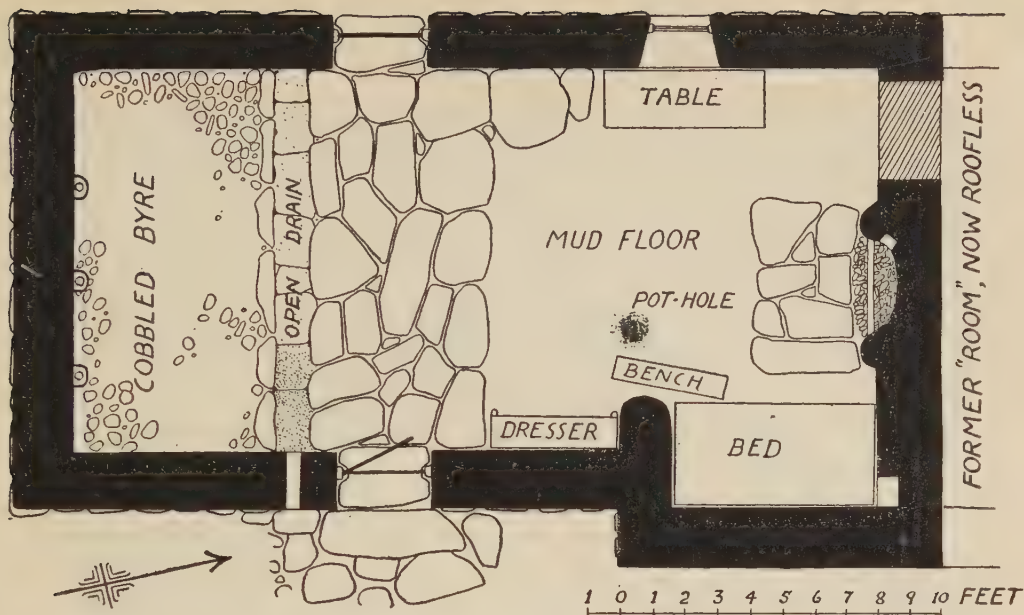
PLAN OF HOUSE A, MEENACREEVAGH
